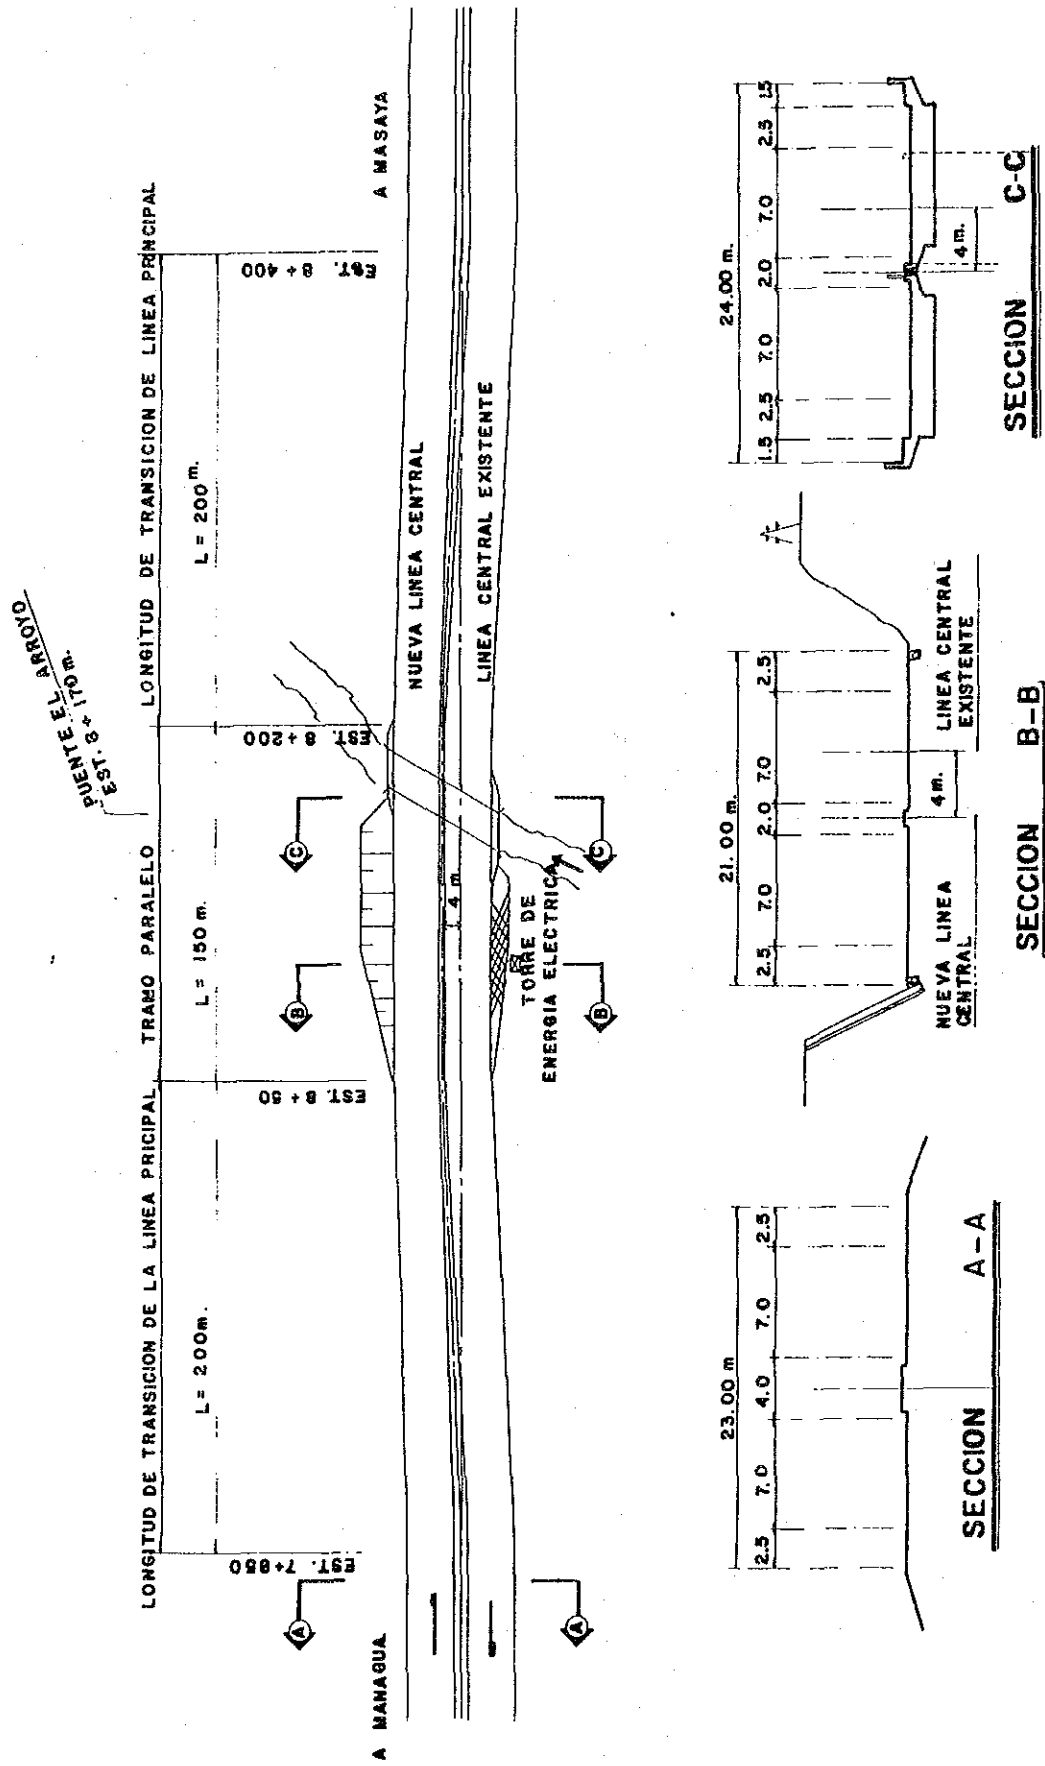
Improvement of Alignment at El Arroyo Bridge (Cross Section)
